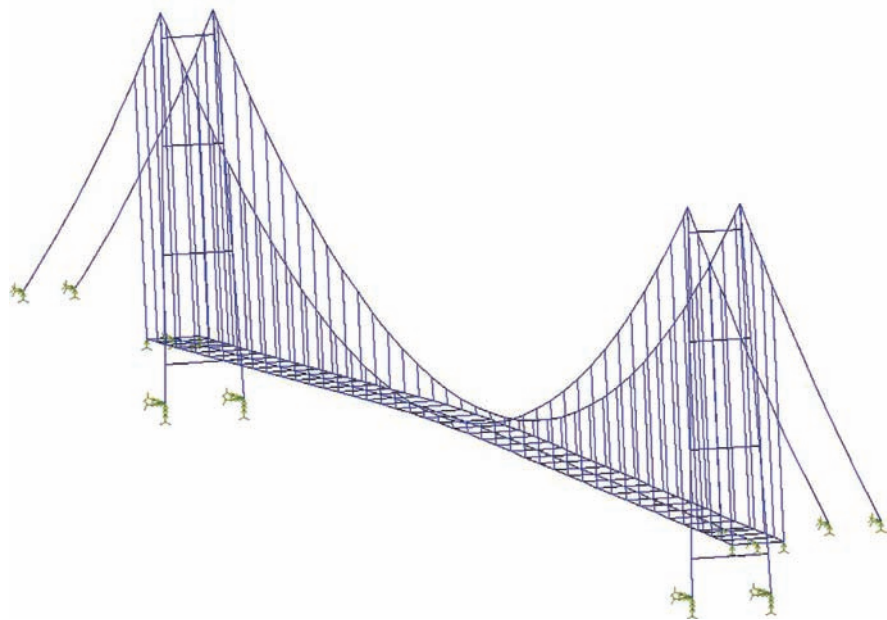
Finite element model of the Messina Strait Bridge.
